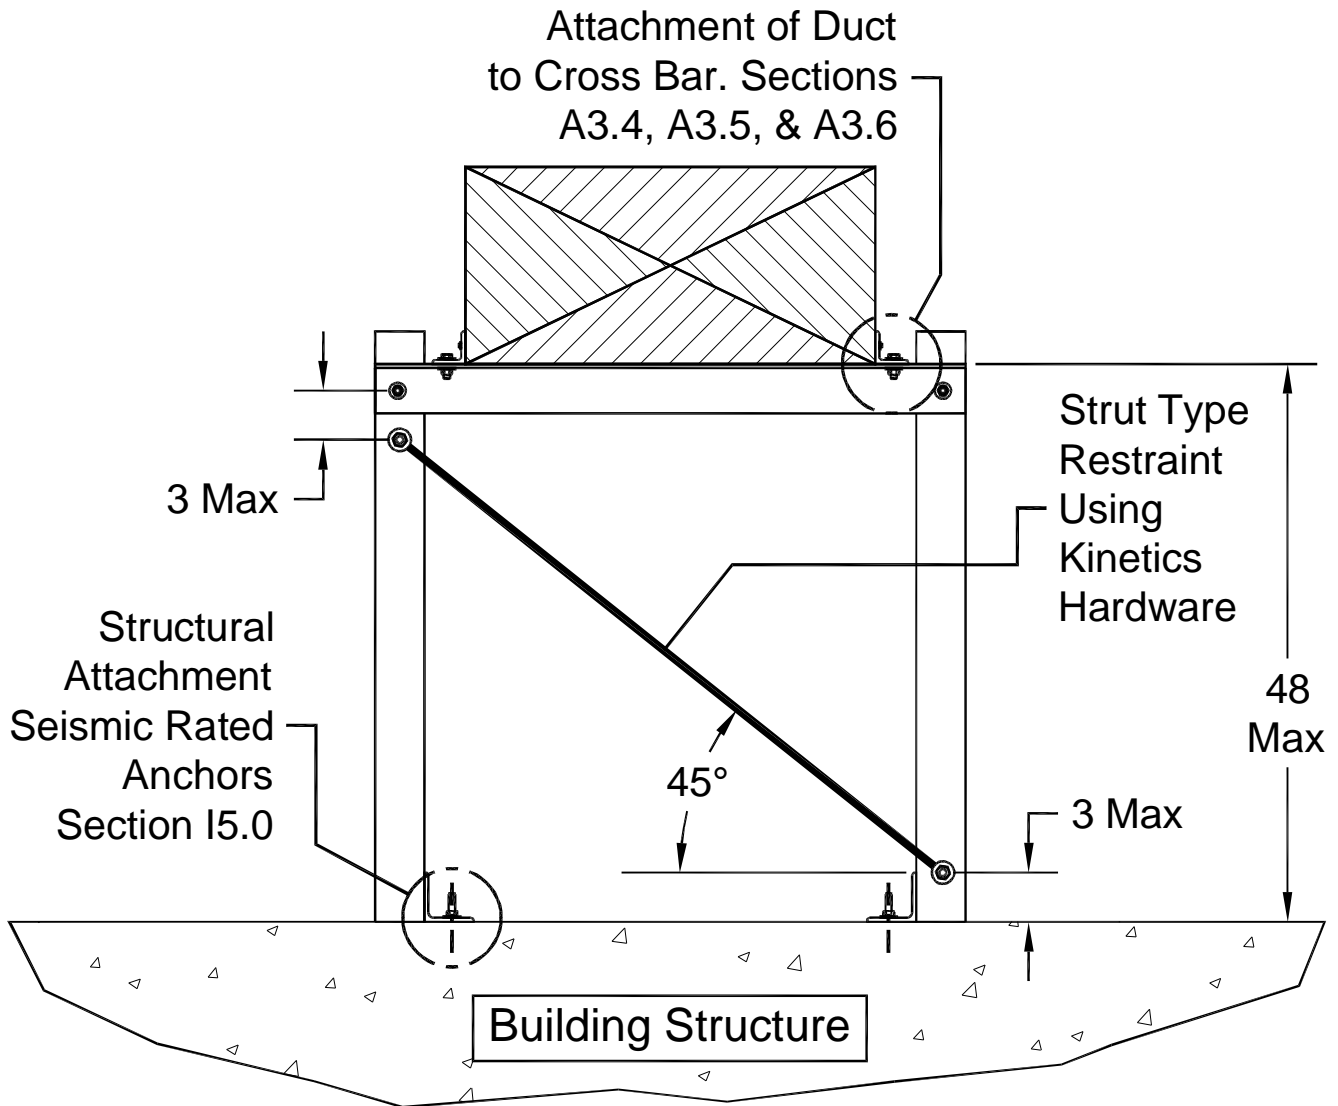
85; Transverse (T) Strut Type Restraint Schematic for Floor/Roof Mounted Duct – Cross Brace Strut at a 45° Angle
